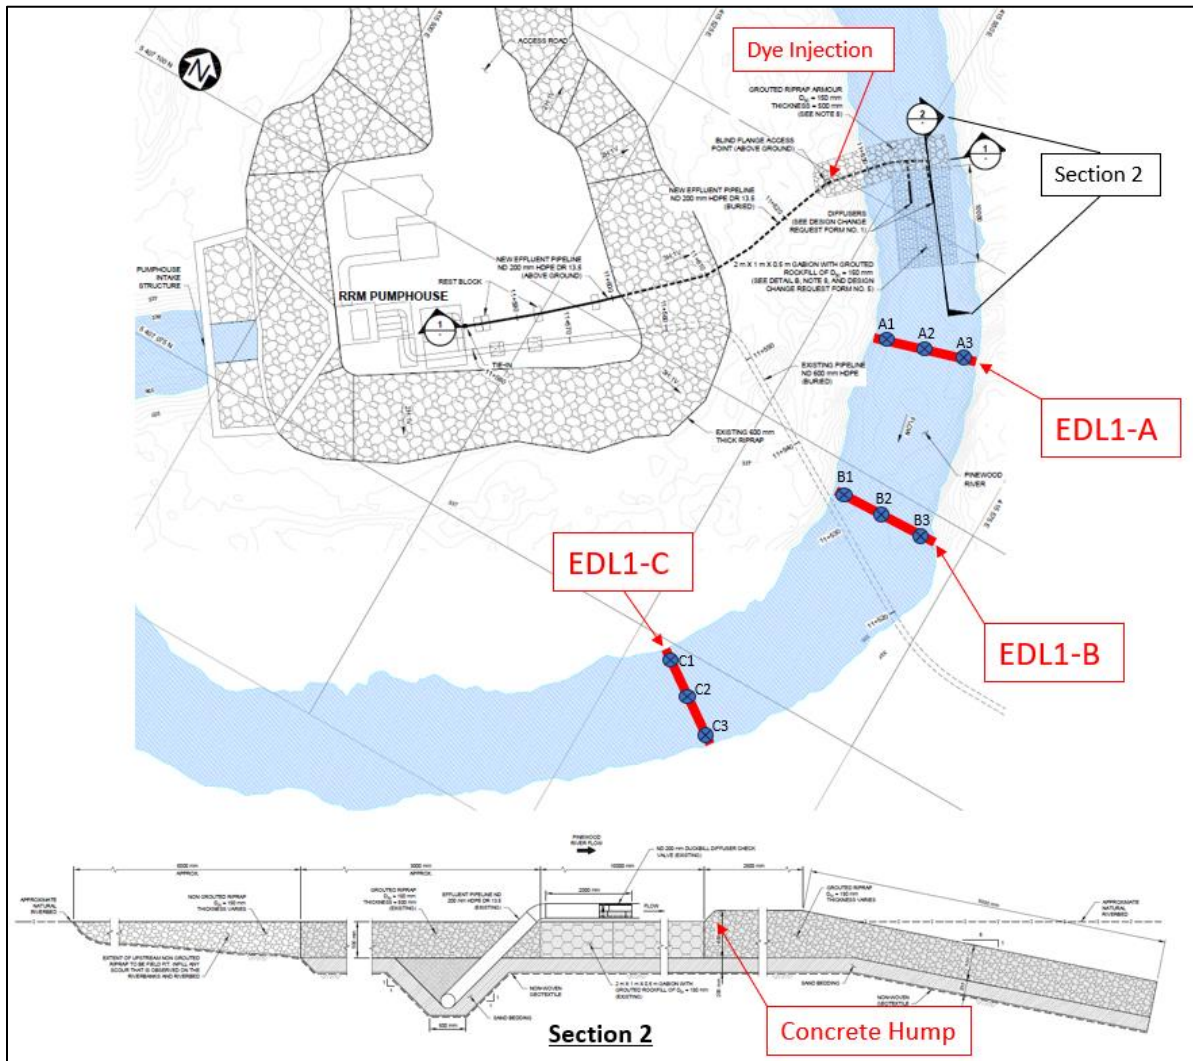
EDL 1 Plan View and Long Section of the As-Built Drawings with Mixing Study Transect Locations (Source: Drawings RR-C1100 and RR-C1106, KP, 2020a)
